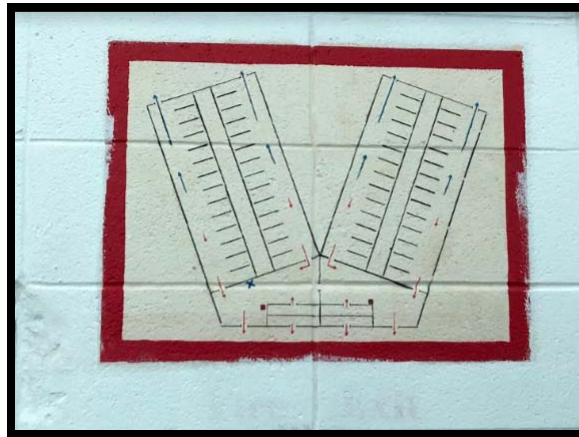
Floor Plan for One of Closed-Cell Block Buildings at Camp J.
